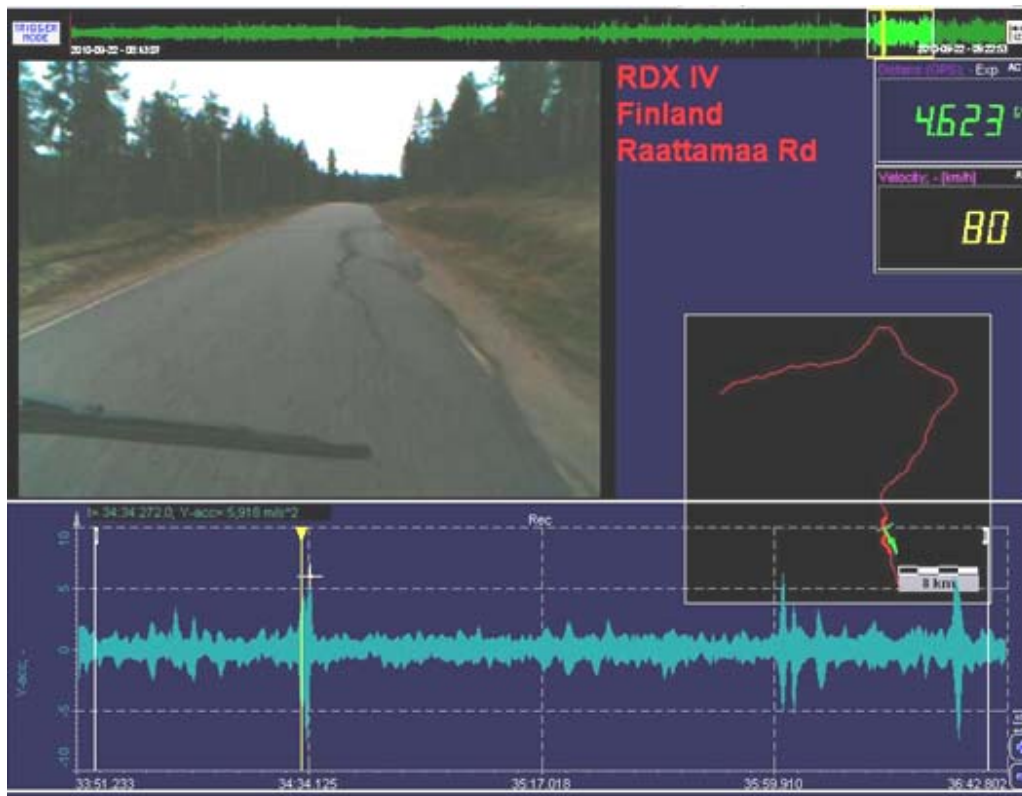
Hazardous truck cab lateral vibration at deformed pavement edge on Roads 956/957
